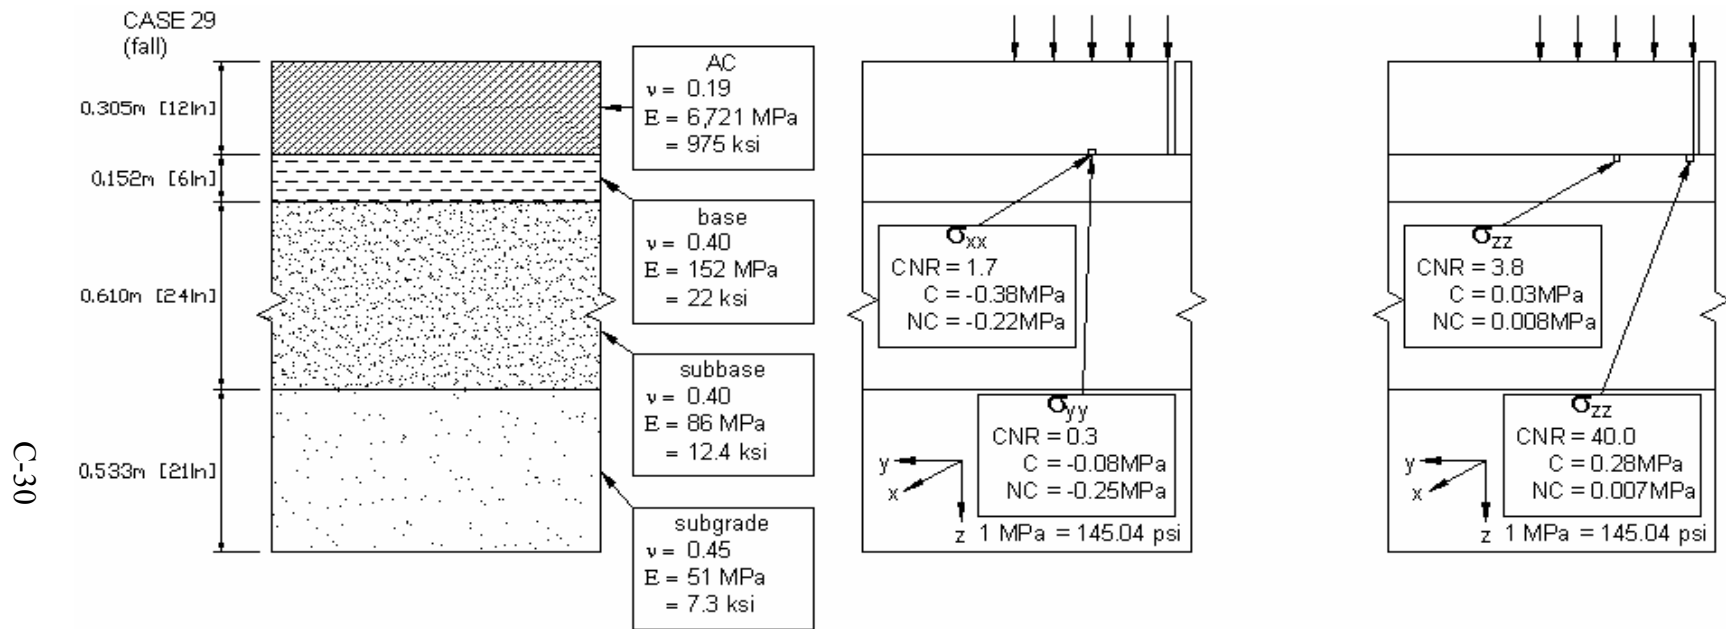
Summary cross section for case 29, (C – stress in cracked pavement, NC – stress in pavement with no crack, CNR – crack/no crack (stress) ratio)
